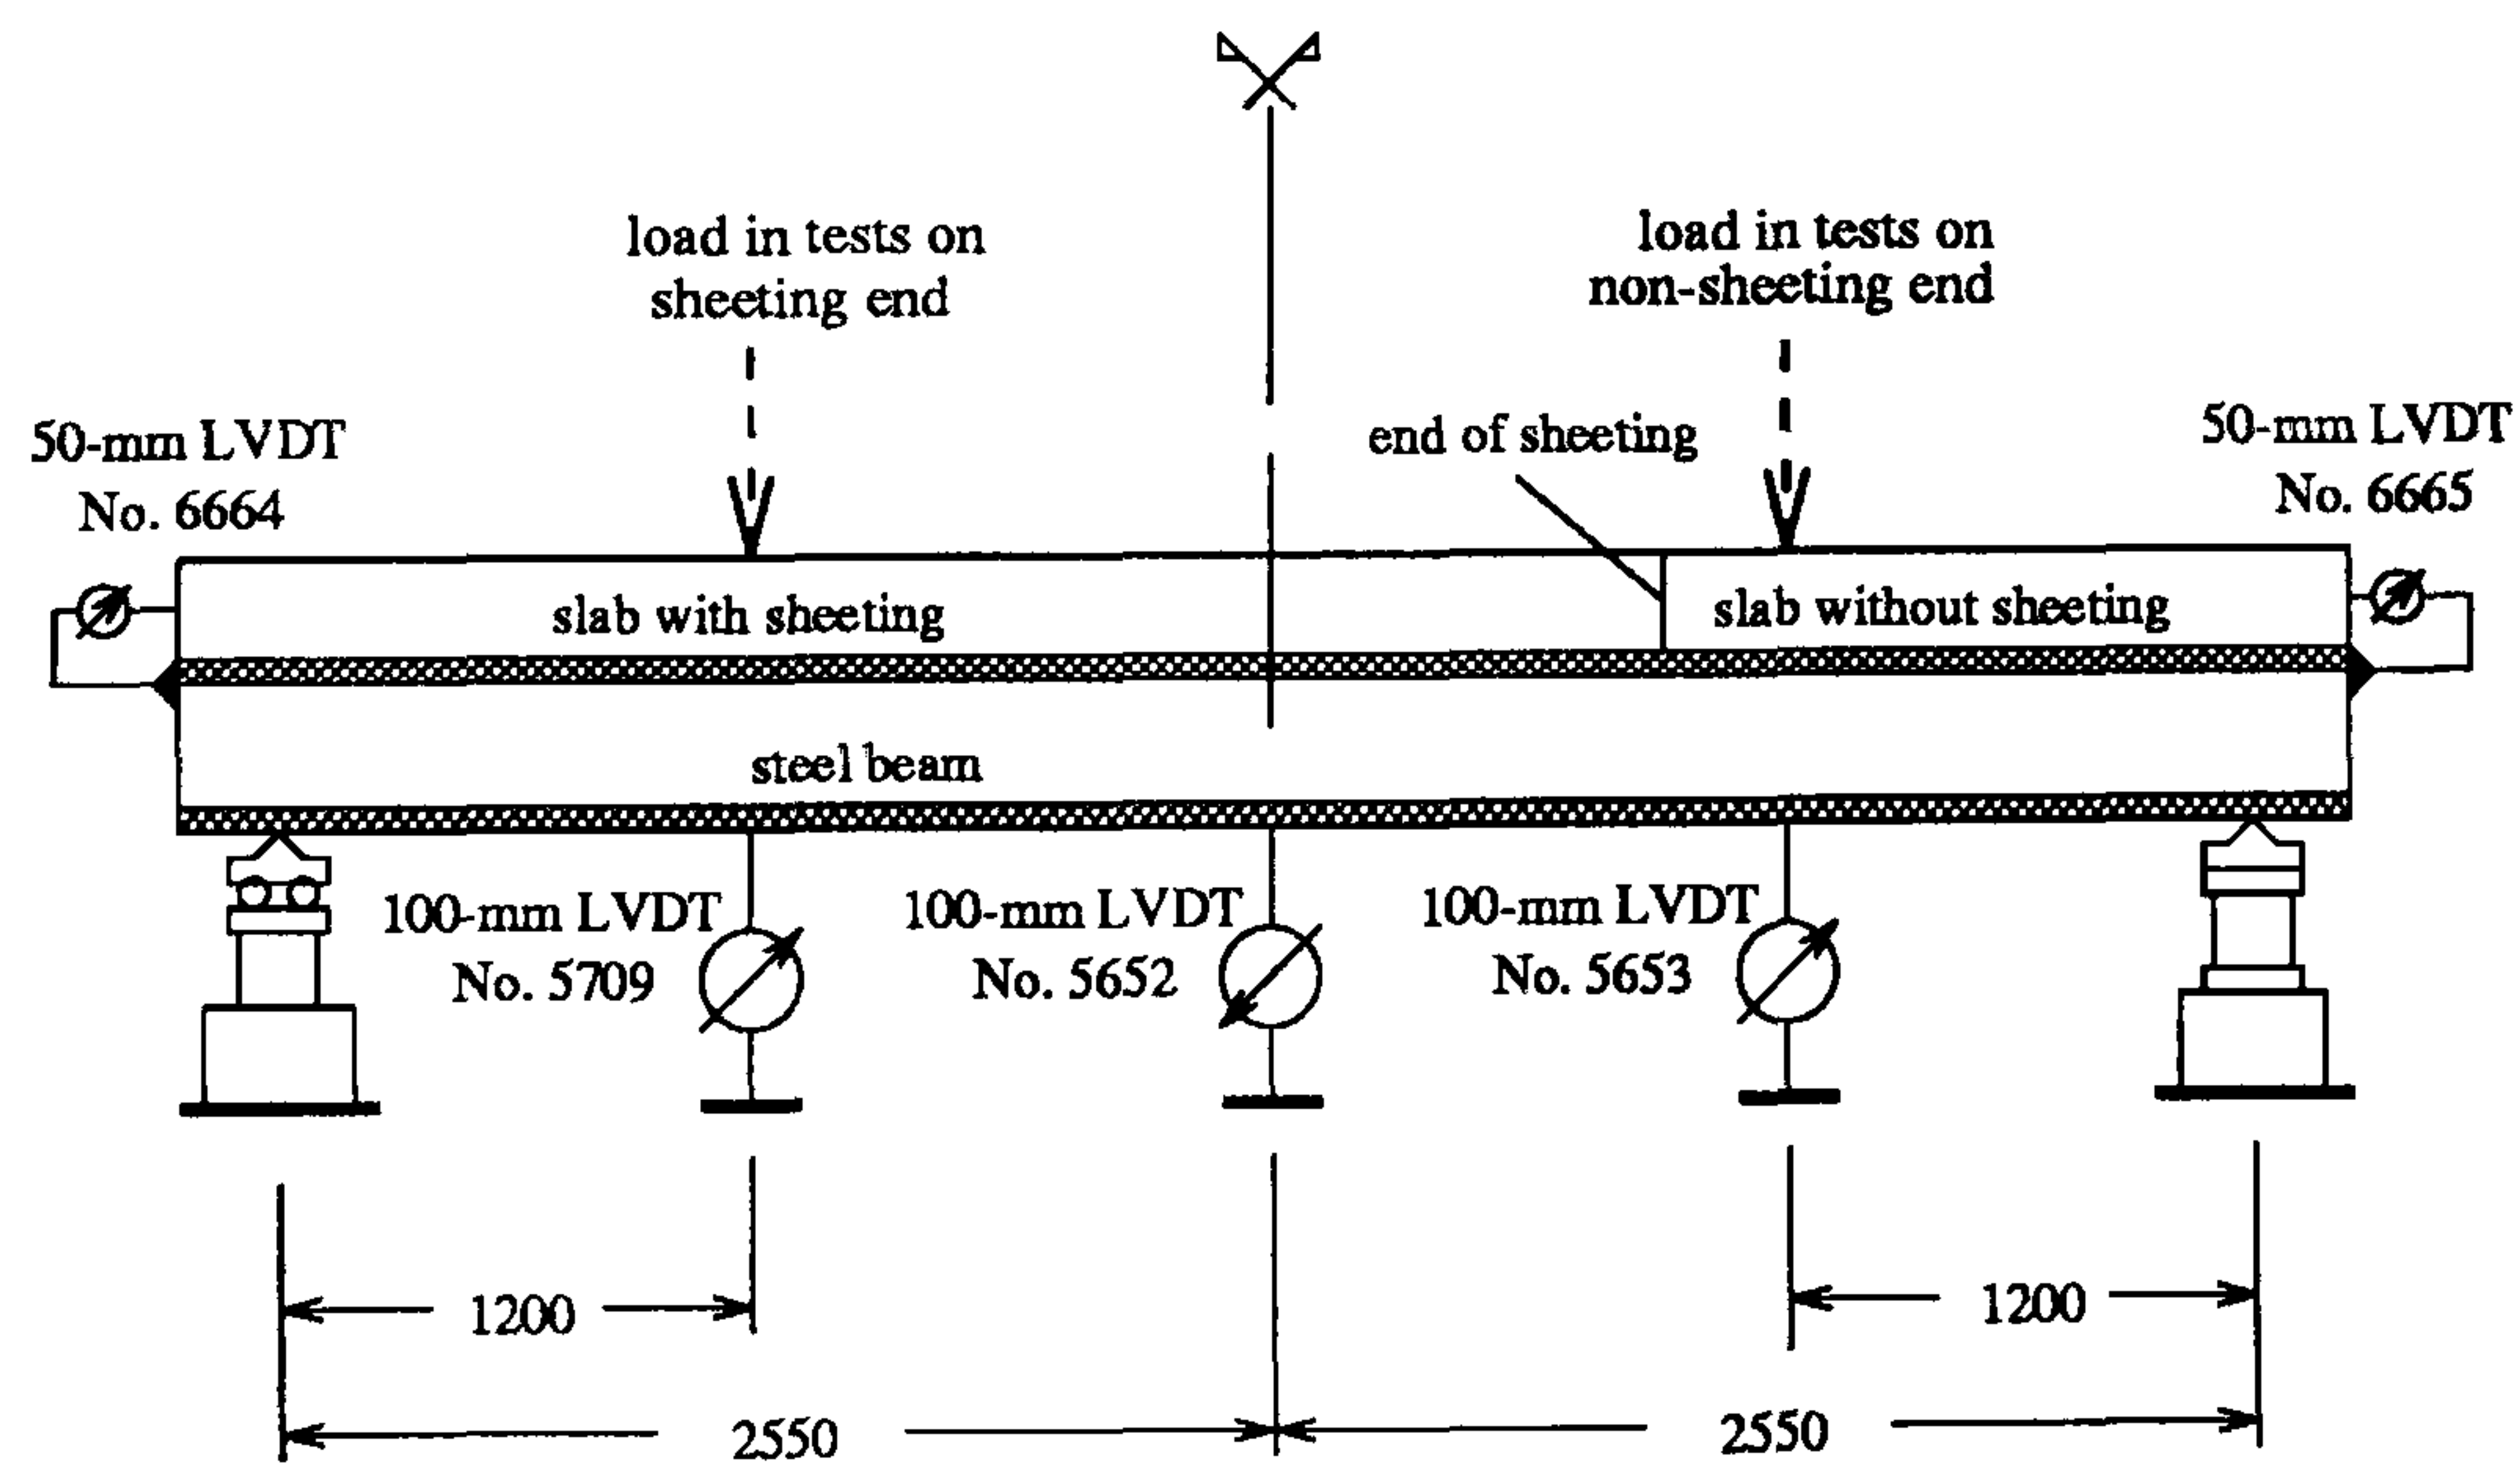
LVDTs used in specimens TR2T and TR2P
